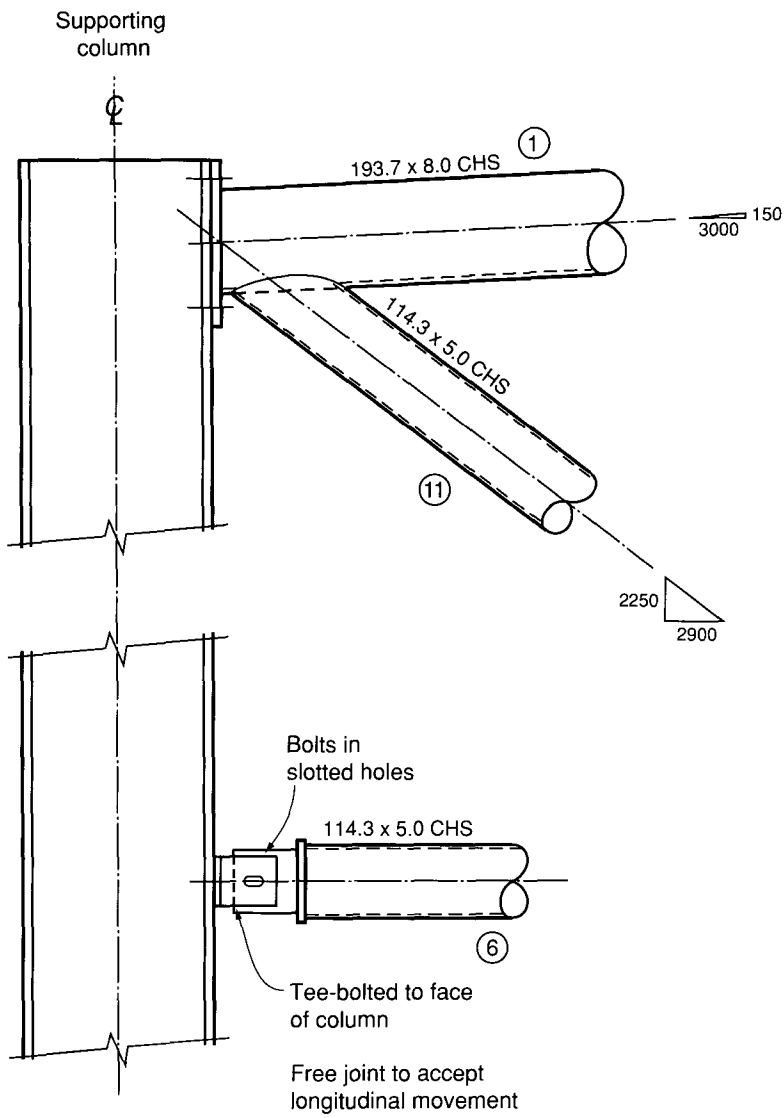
Support details, members 1, 11 and 6 (dimensions in mm)
